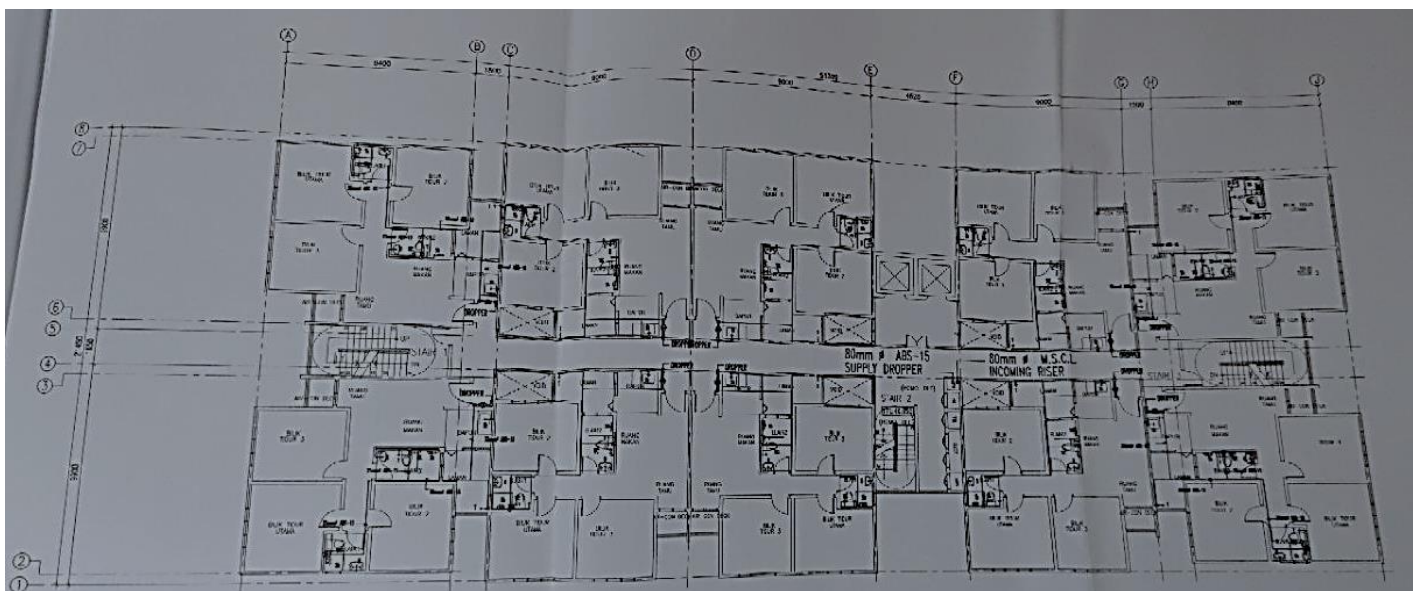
First to six floor plan of Block A3 Unicity building obtained from Unimap Holding
